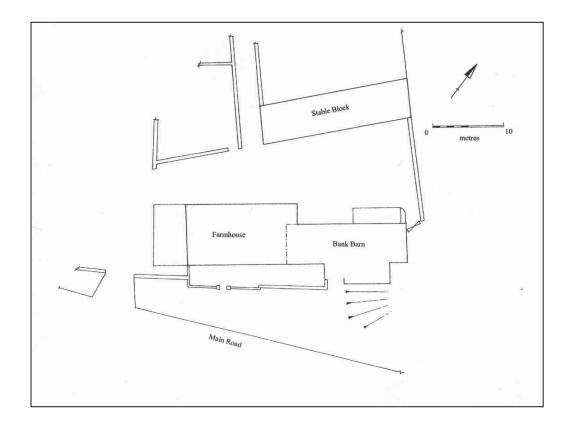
Plan of the existing buildings of Westlands Farm, Crosby, Maryport. Scale: 1:500
